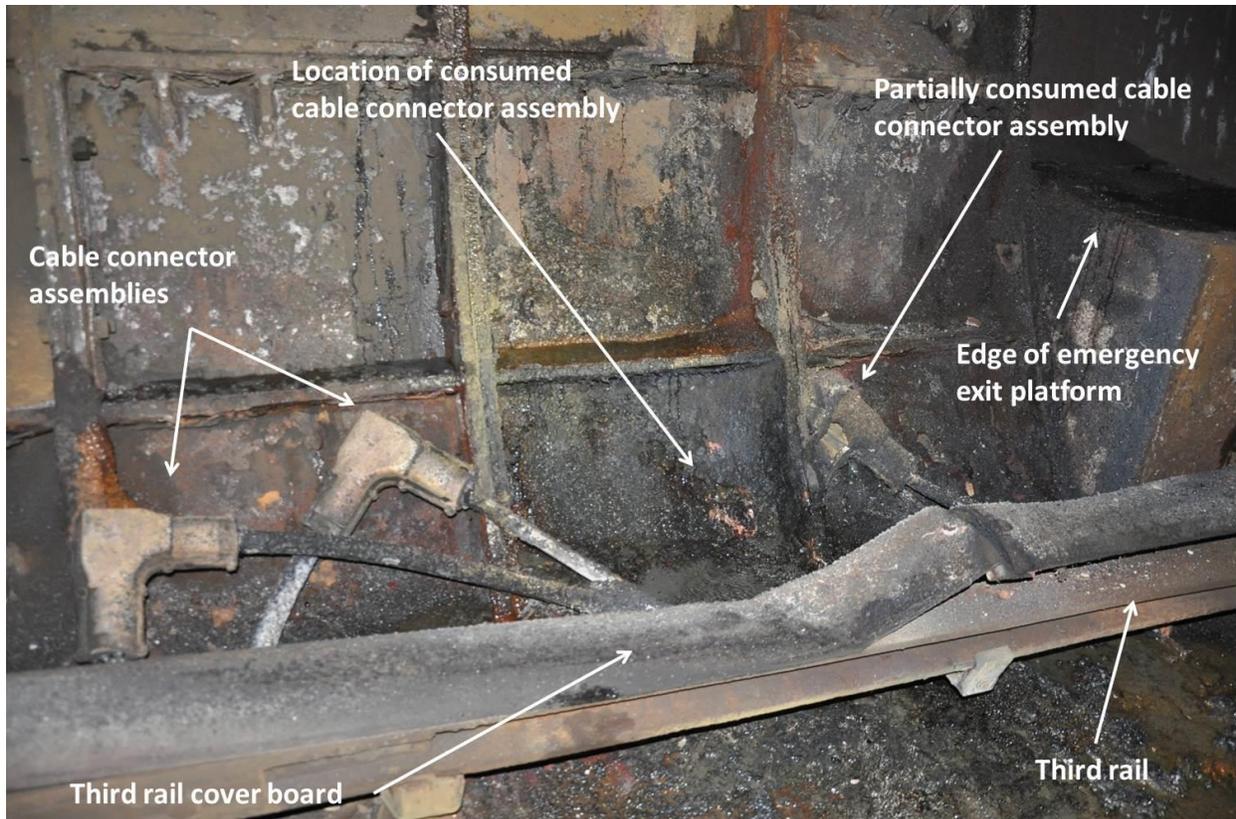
Damaged cables and cable connector assemblies, and cover board.
